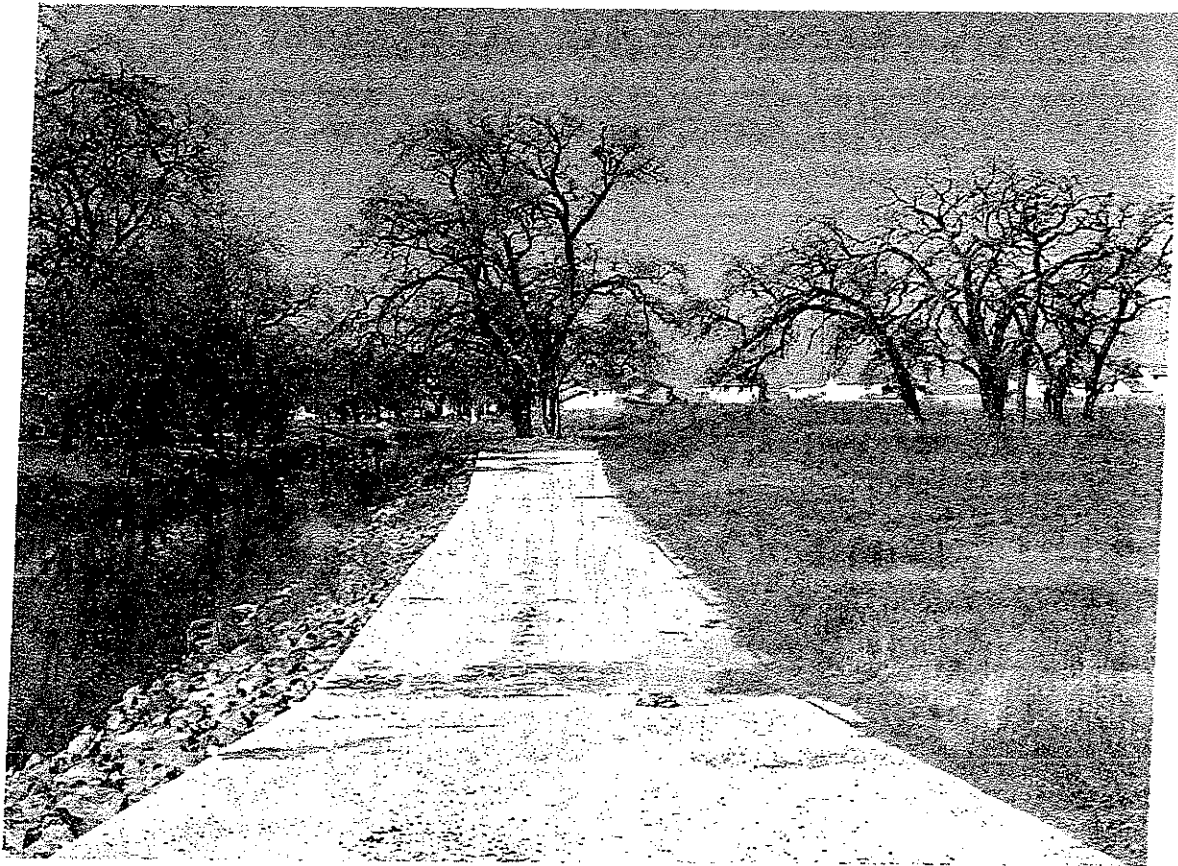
PHOTO OF SPILLWAY LOOKING WEST ALONG LEVEE ROAD
